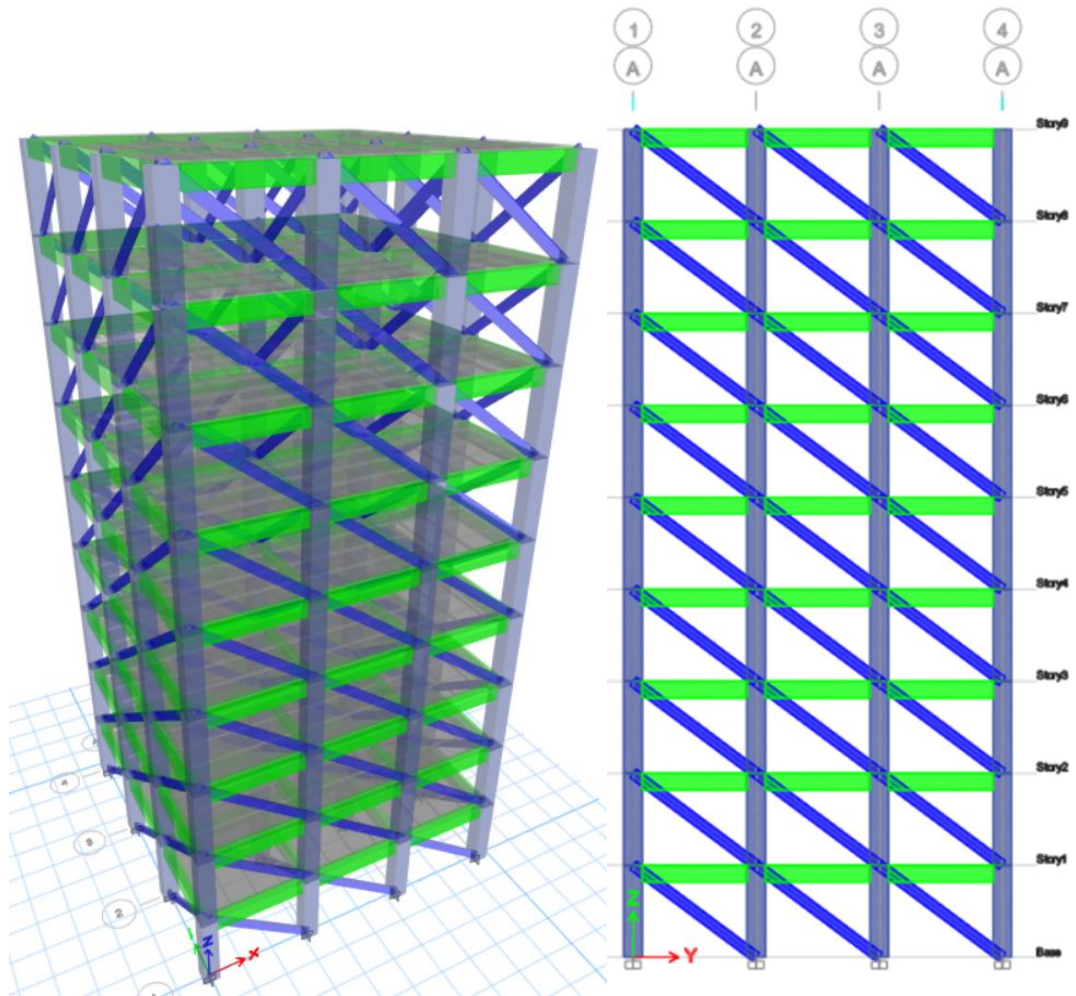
3 (a) Sample 3D model of Building with single strut (b) Sample elevation of single strut model
